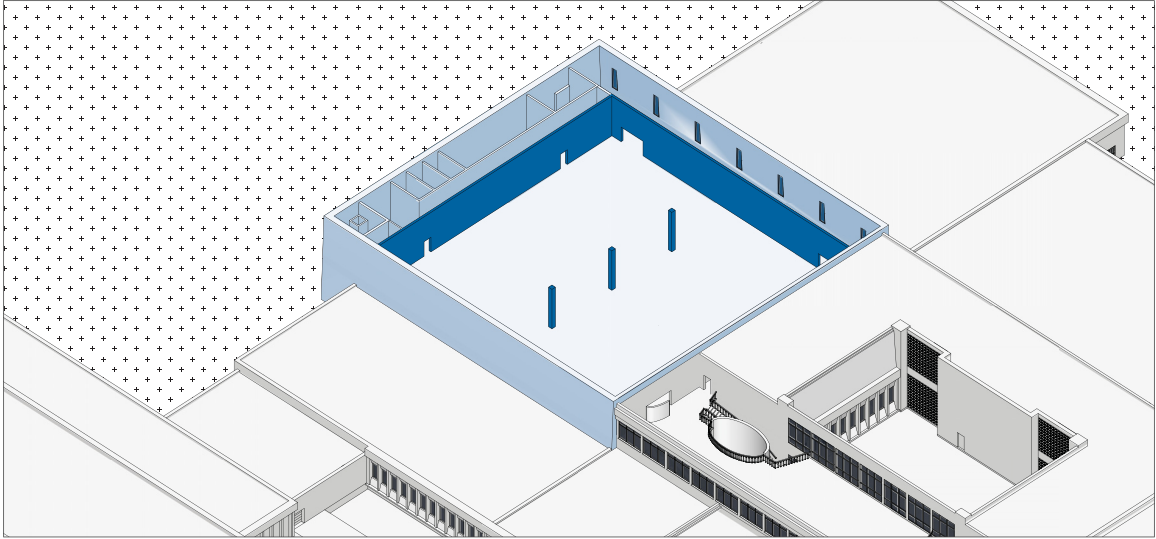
Existing West Exhibition Room Floor 1 & 2 (1304 m²) will be converted to the school of architecture
